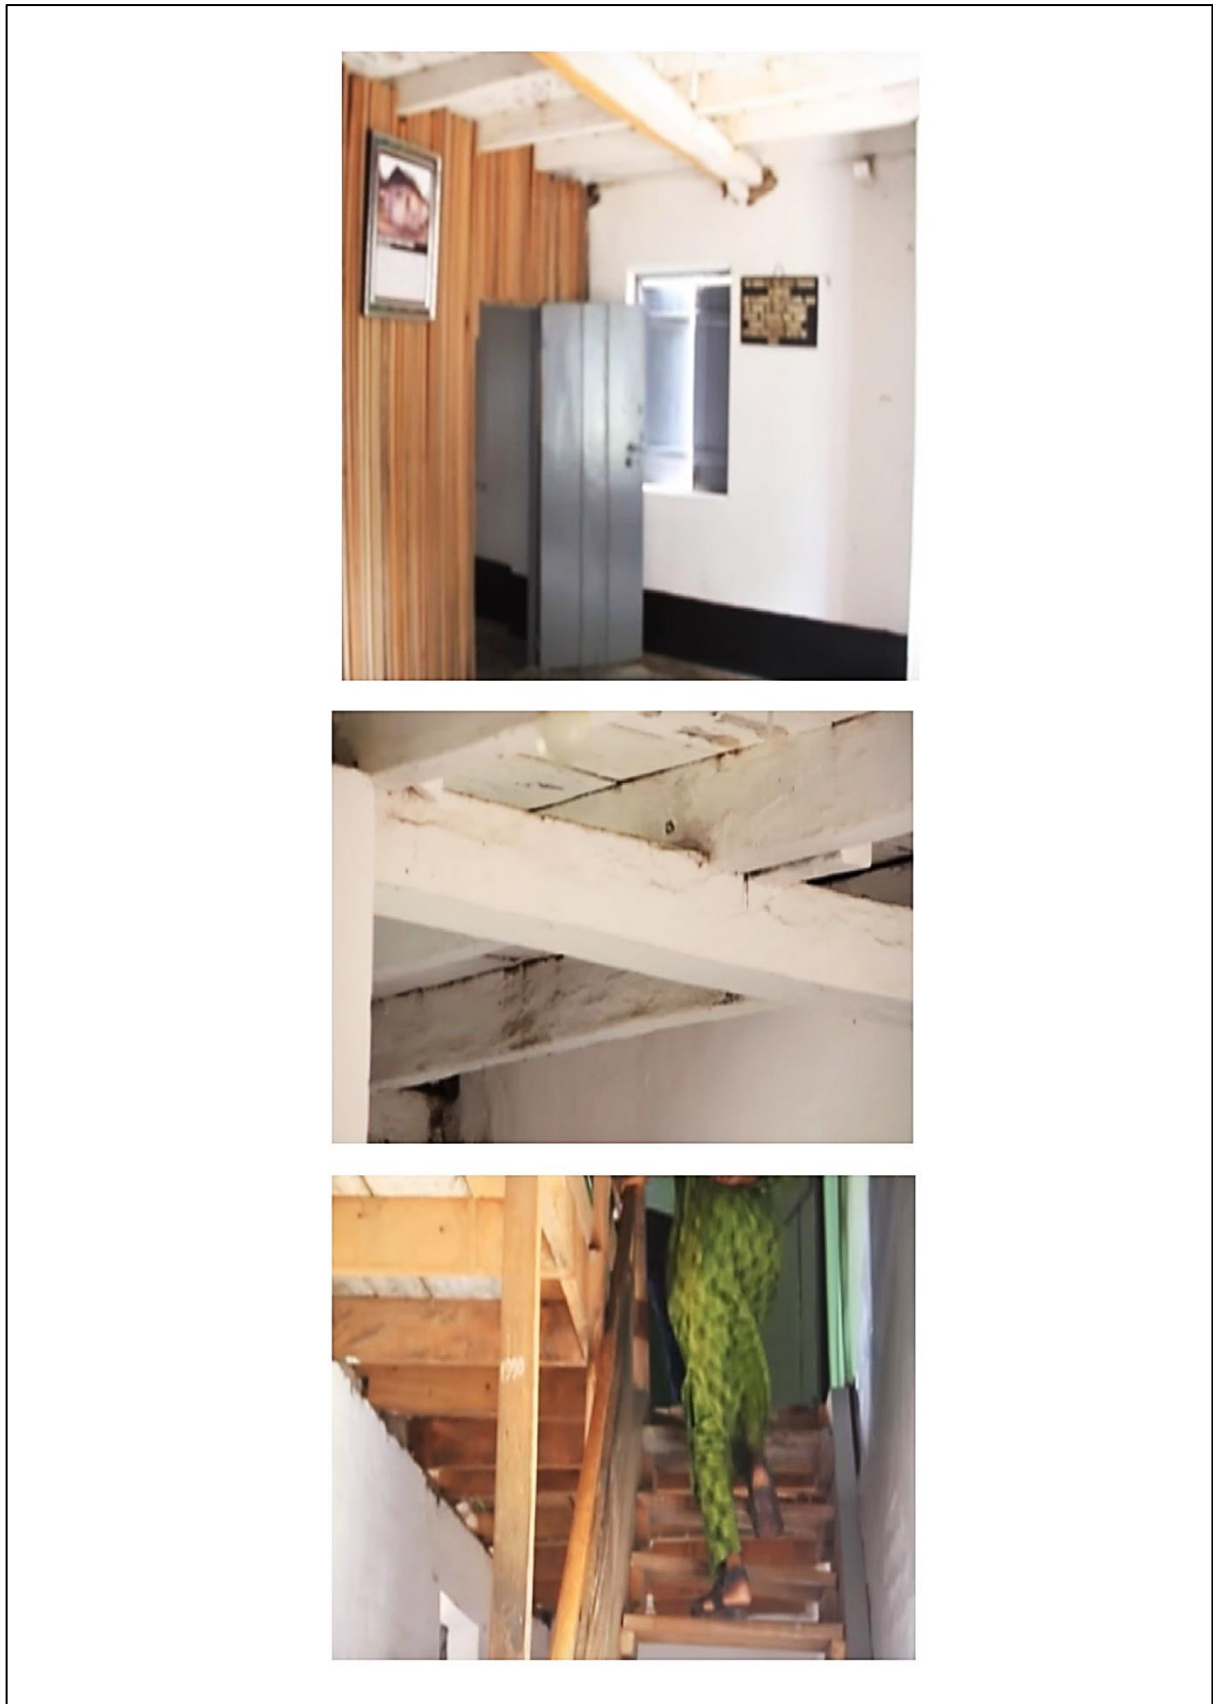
Inside the 1842 mission house built in Badagry, Lagos – first picture show timber partition wall, timber floor joists of the suspended first floor supported by the external brick wall, second picture is a close-up of timber floor joists of the suspended top floor and third picture shows timber stair case leading to the first-floor level; source: NTA (2016).
